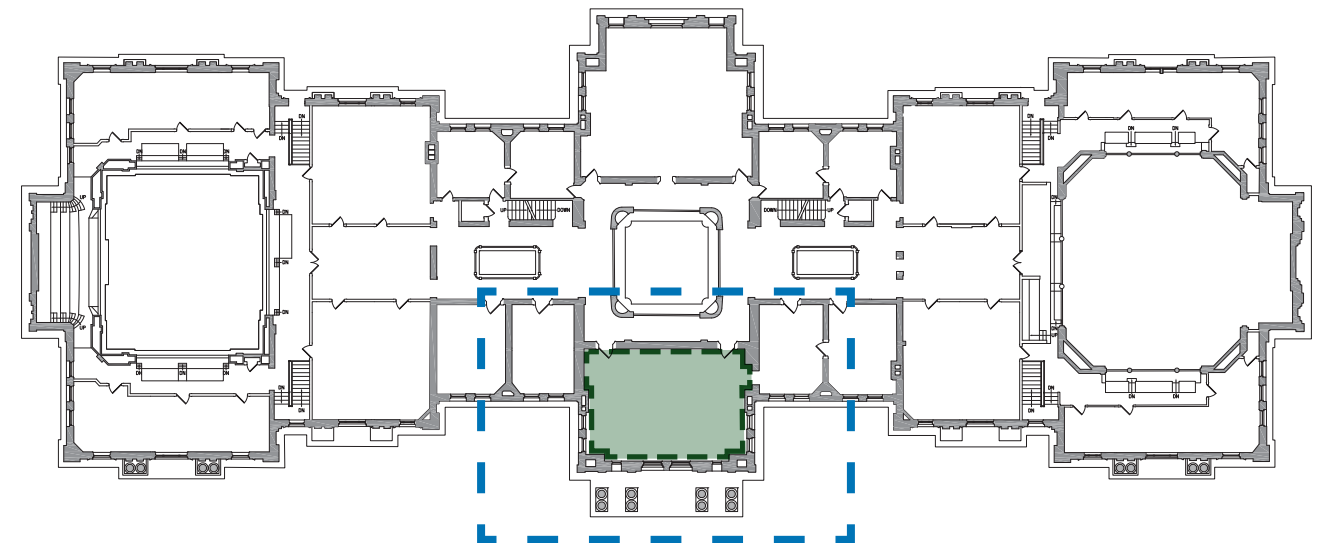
Third Floor Level Selective Removals Plan.
